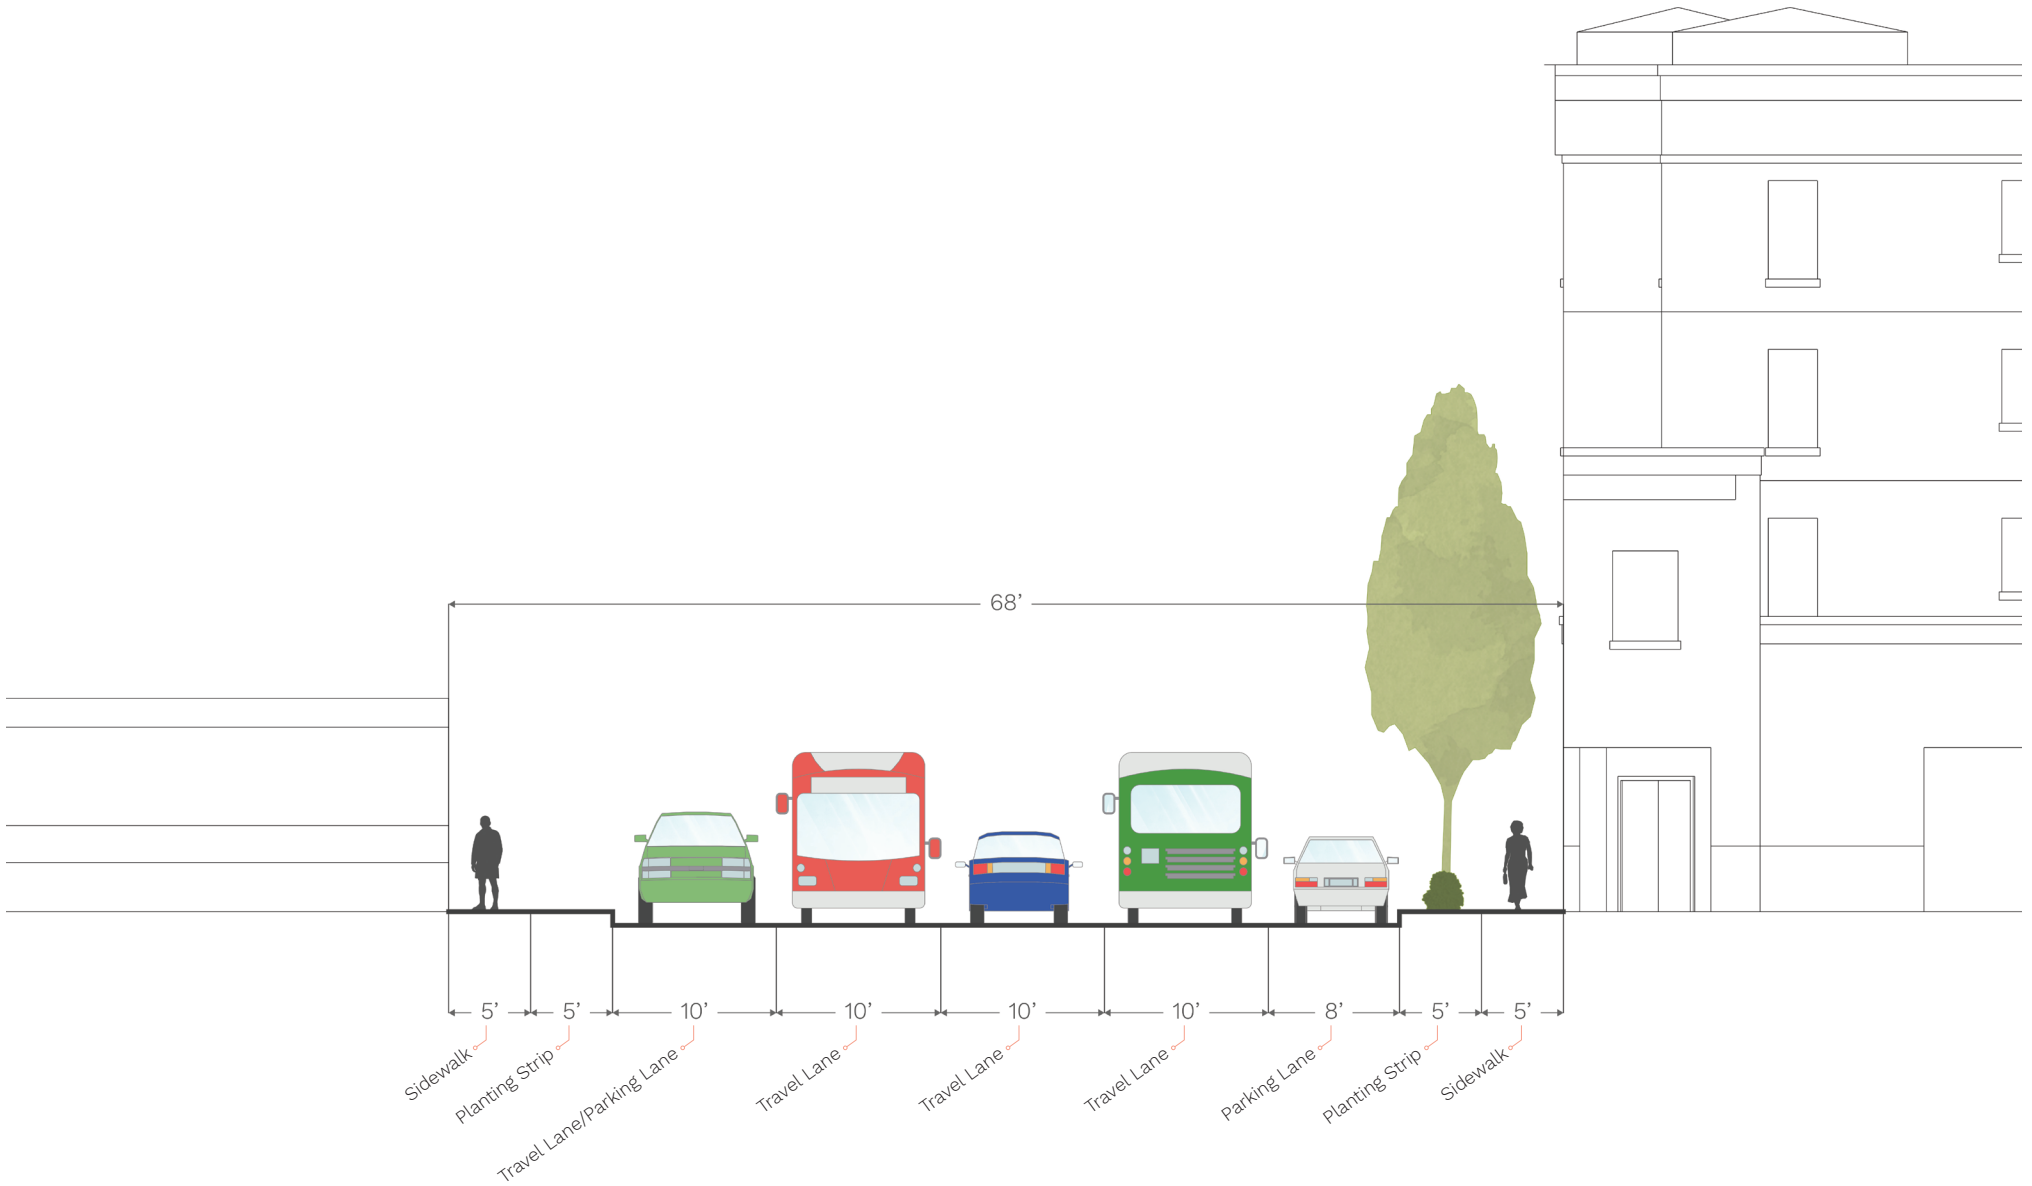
E Madison Street Existing Conditions Section (Facing East)
